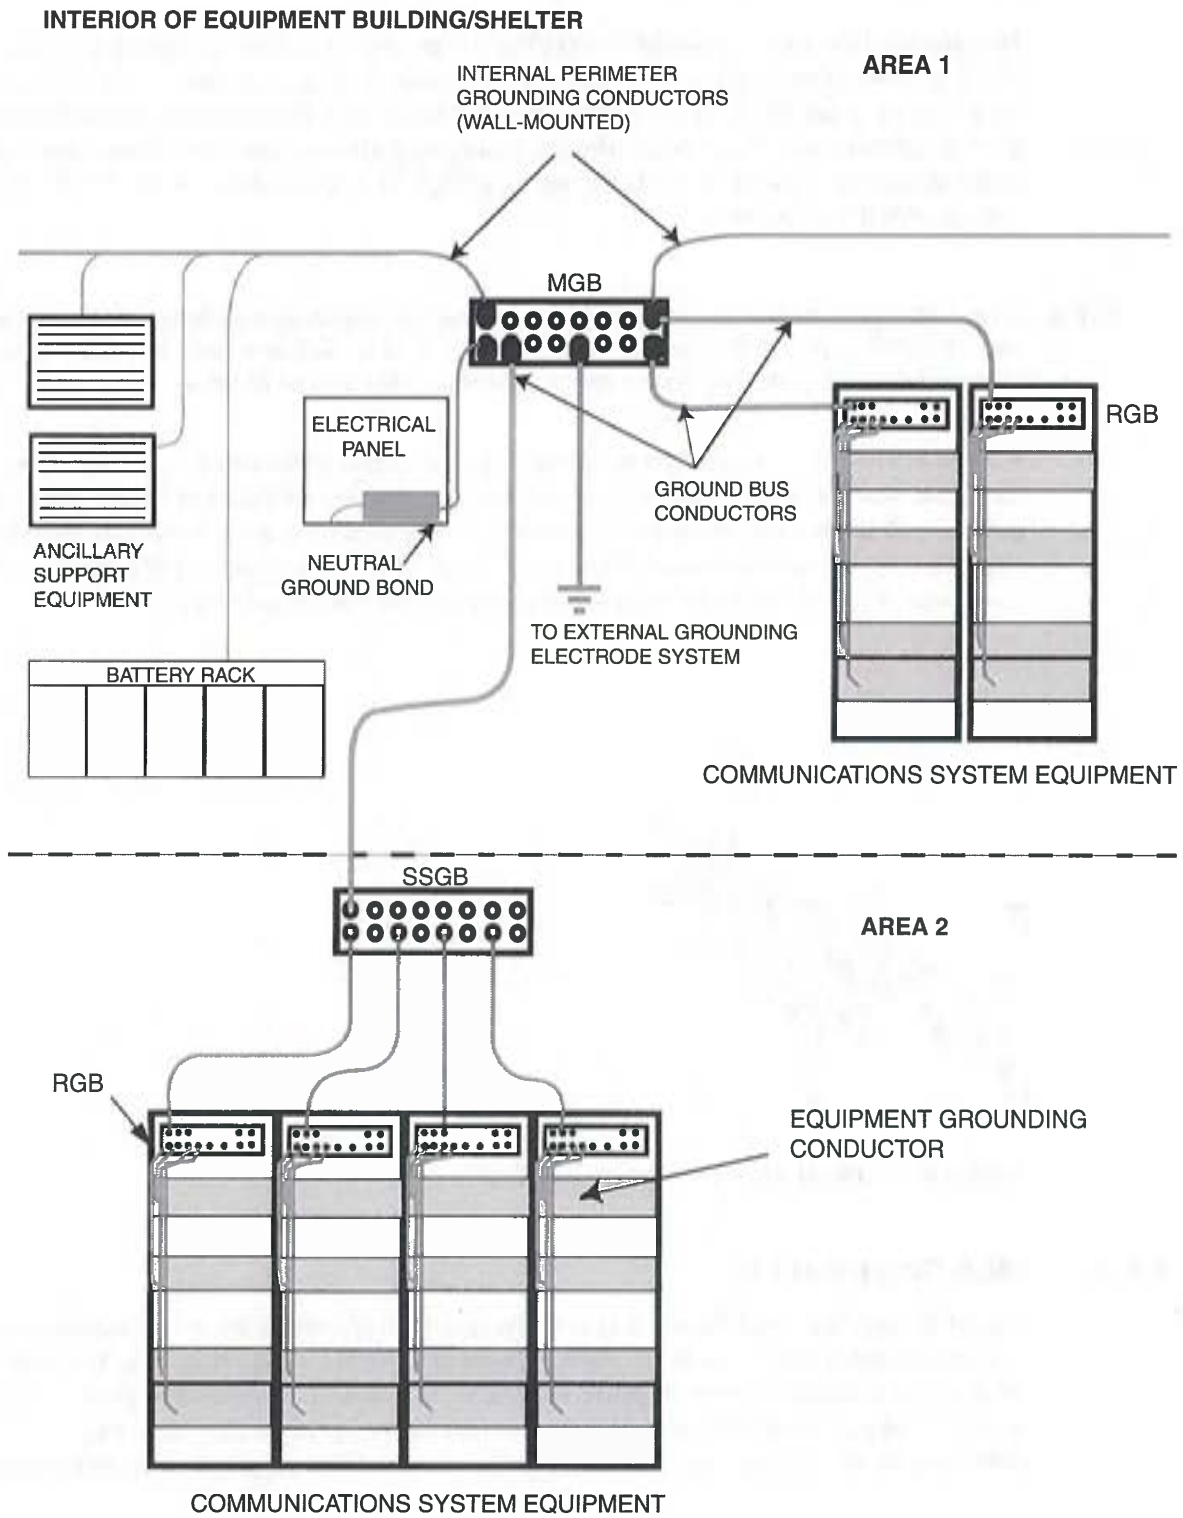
TYPICAL SINGLE-POINT INTERNAL GROUNDING SYSTEM
